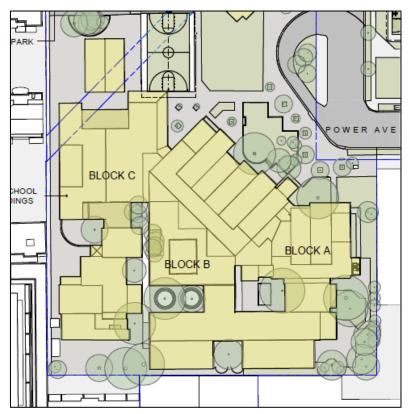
The existing buildings located in the southern section of the subject site. (Source: TKD Architects).
